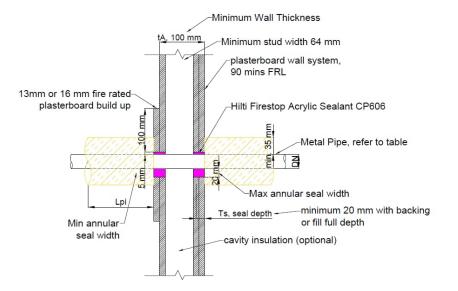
Insulated services penetrating -/90/90 and 90/90/90 framed walls
